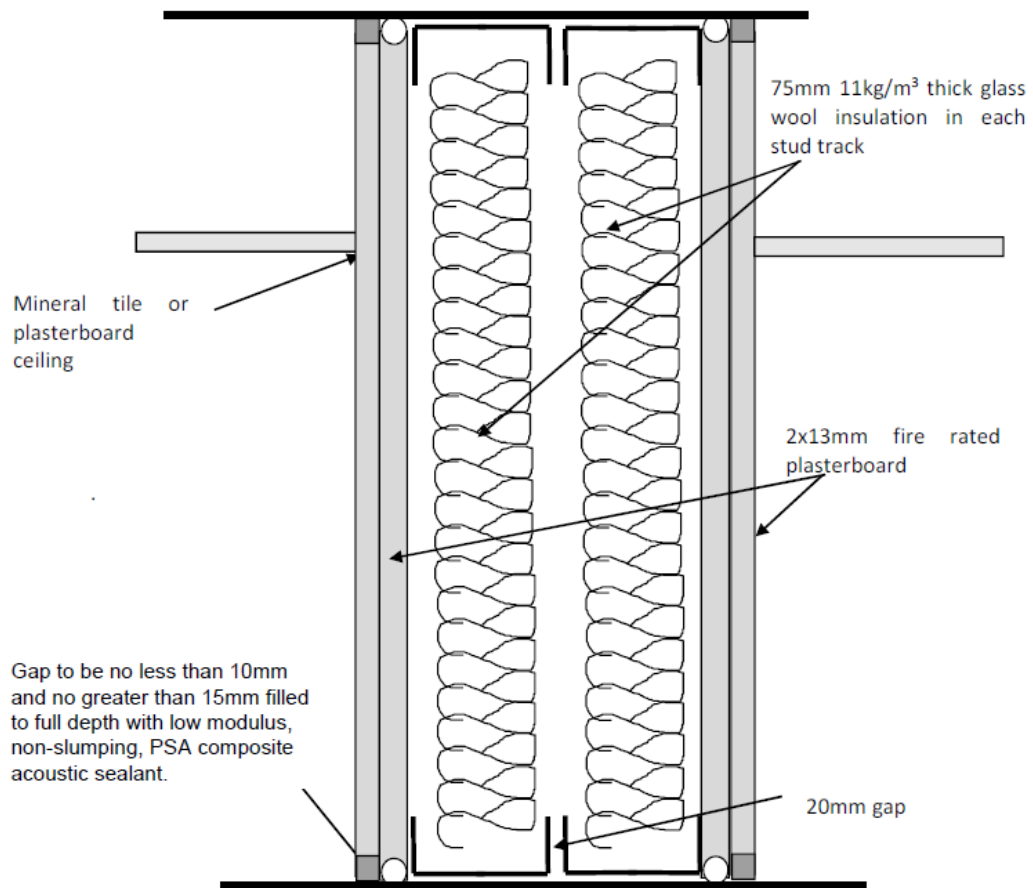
Plant Room adjacent to Office/ Consult Room Wall Detail
